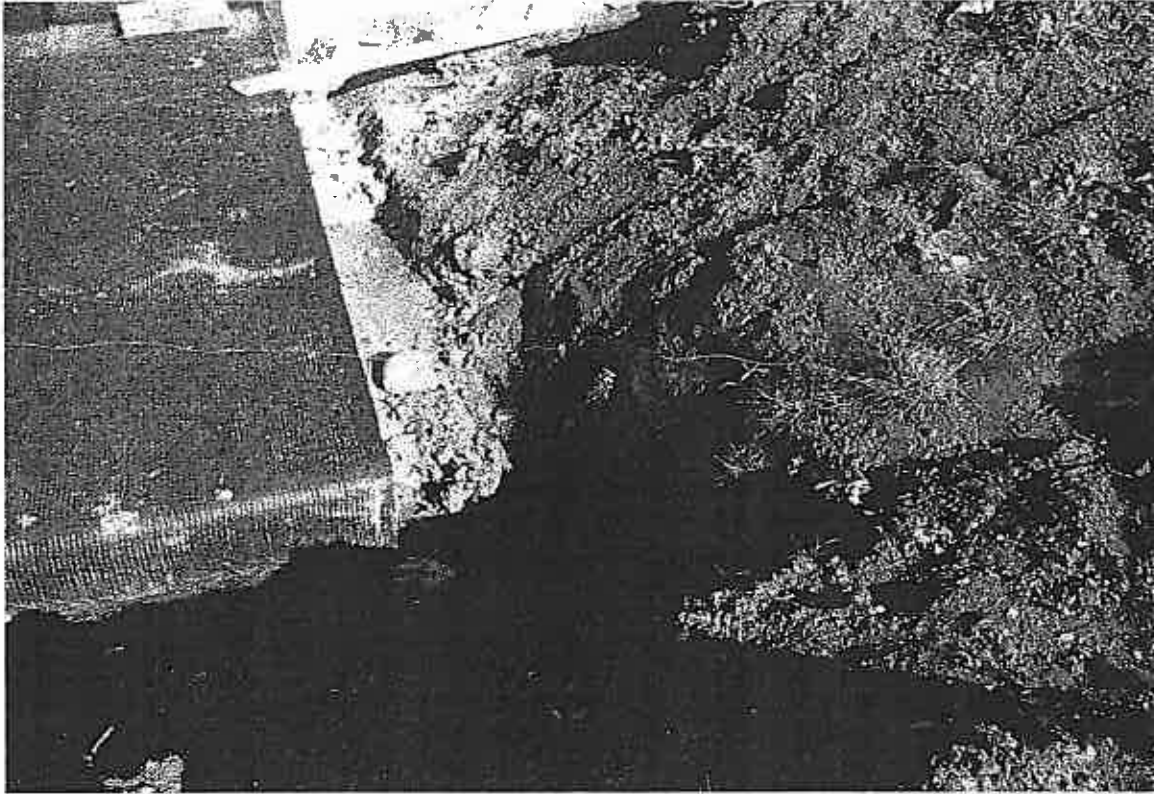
Shows typical areas being chipped of the existing delaminated concrete and preparation for repair.
